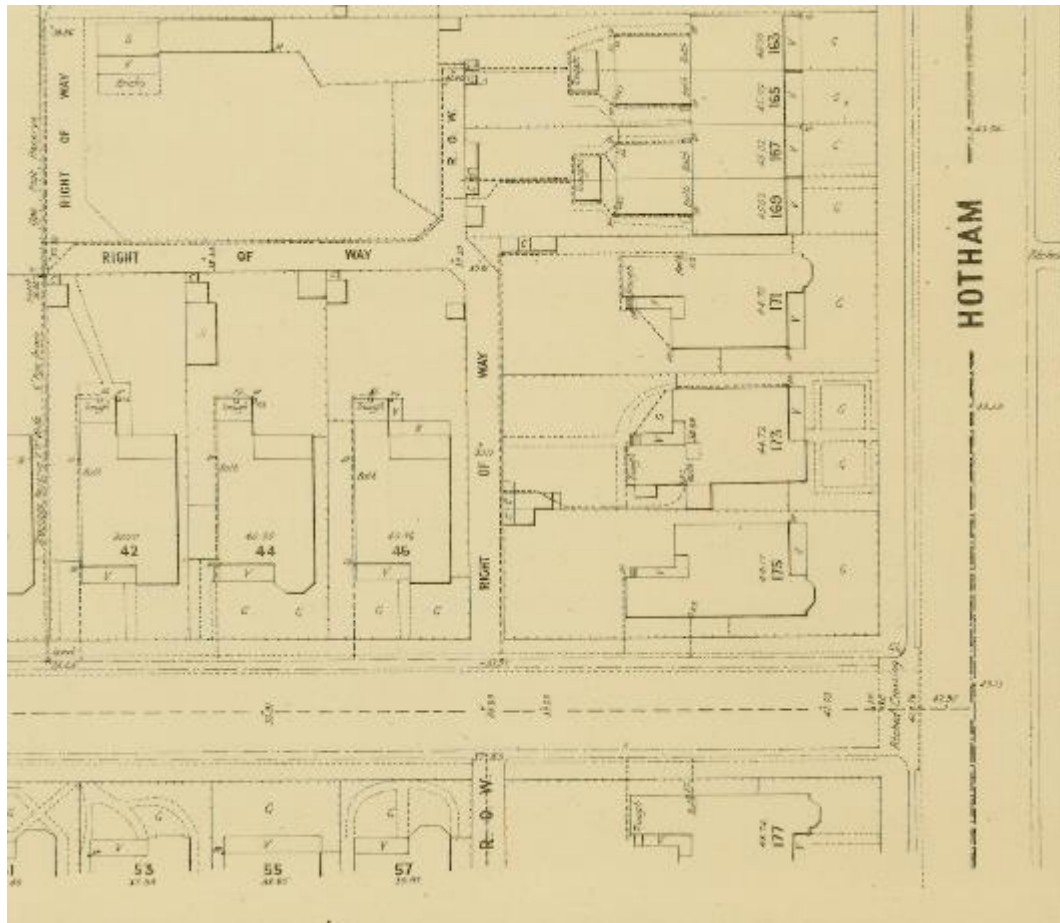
Extract of MMBW Detail Plan 1438 showing the terrace and houses, then numbered 163-175 Hotham Street, and some of the similar villas lining The Avenue
